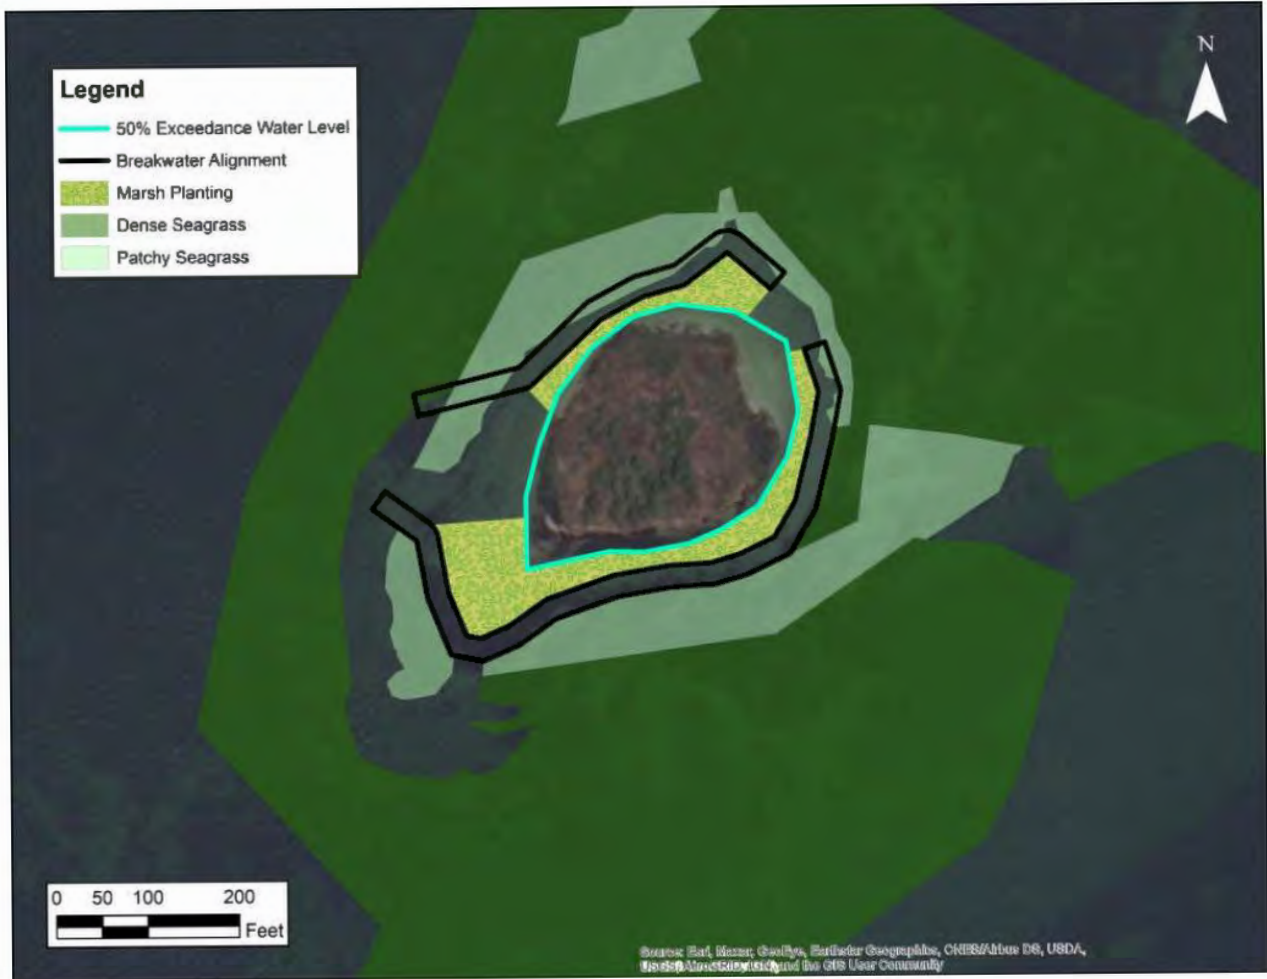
Plan view of Alternative 3: riprap breakwater with marsh fill and planting
